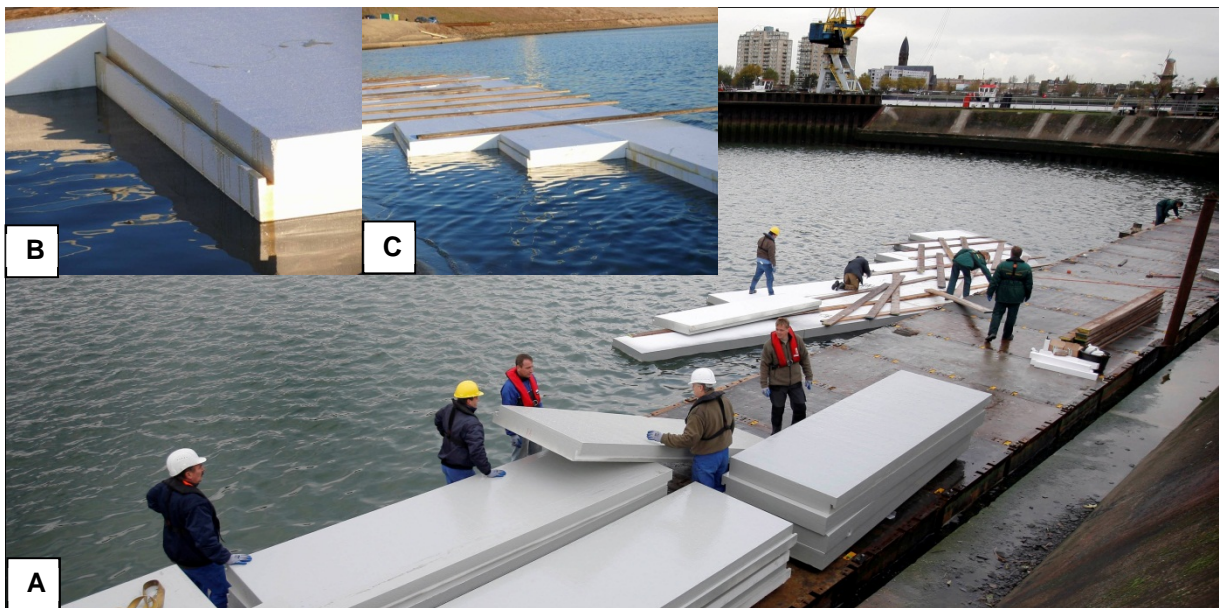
A: Constructing the first EPS layer B: The scarf joint C: Wooden planks on the joints [www.flexbase.eu]
